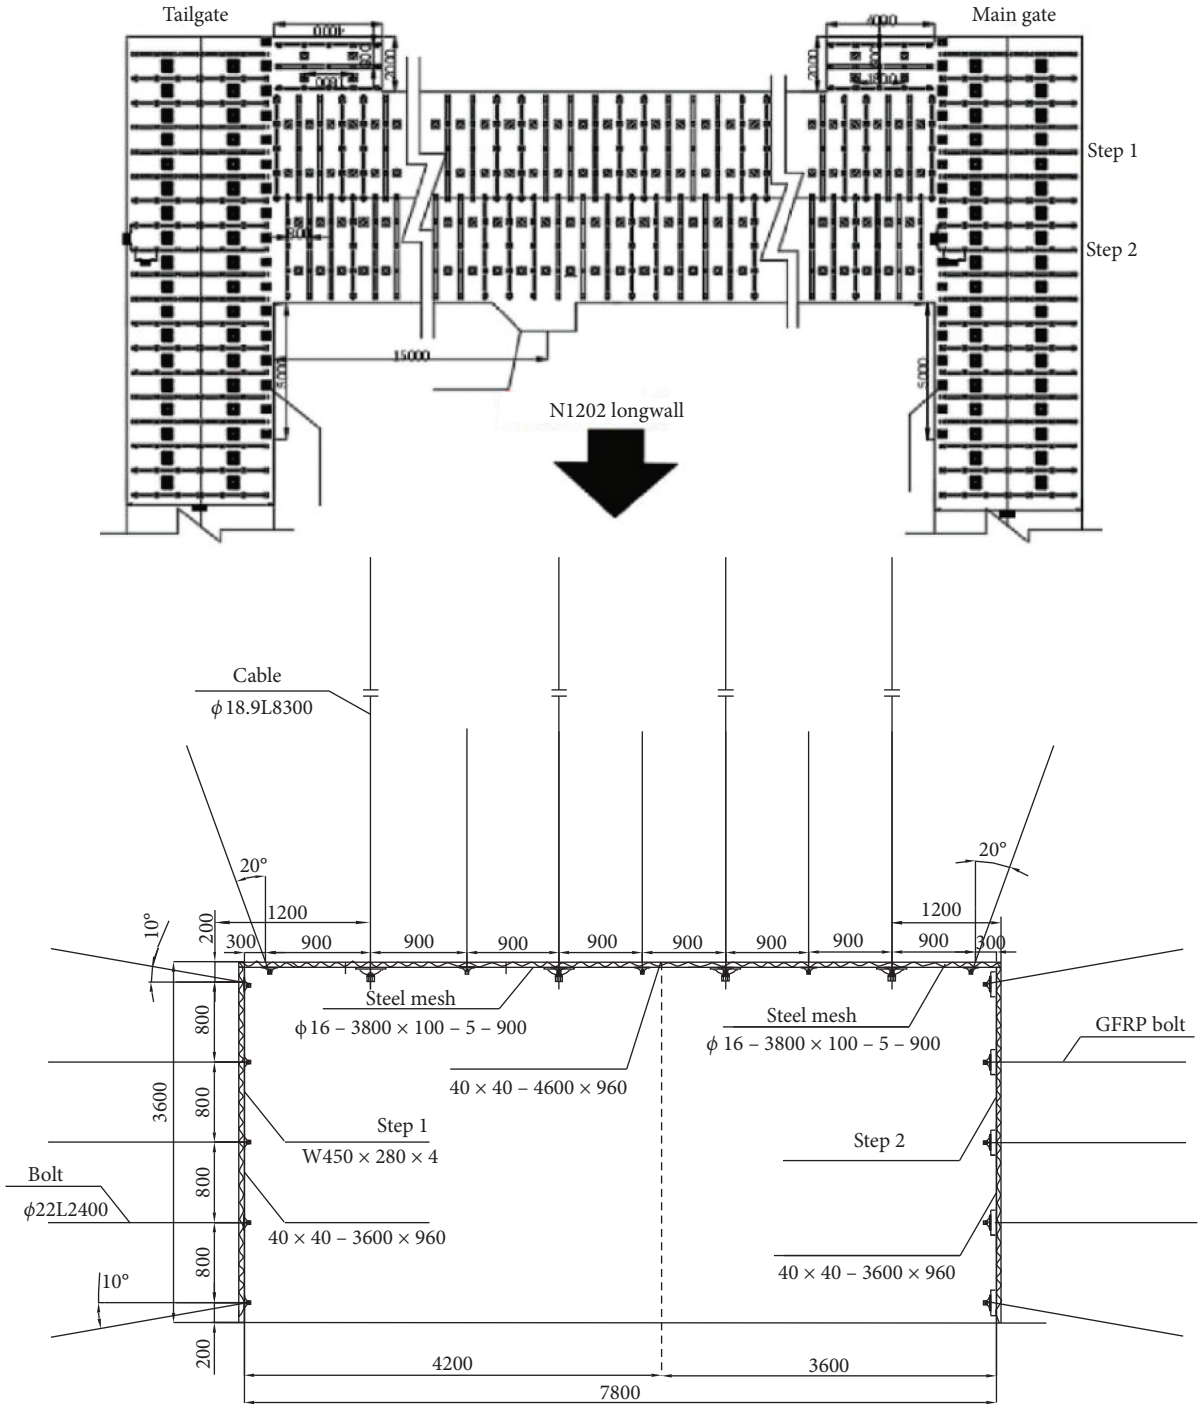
The cross section of the supported predriving roadway in the N1202 longwall.
